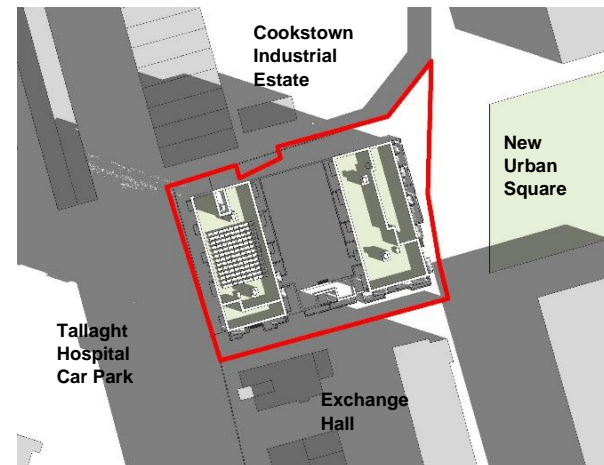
Proposed March 21<sup>st</sup> – 9am
